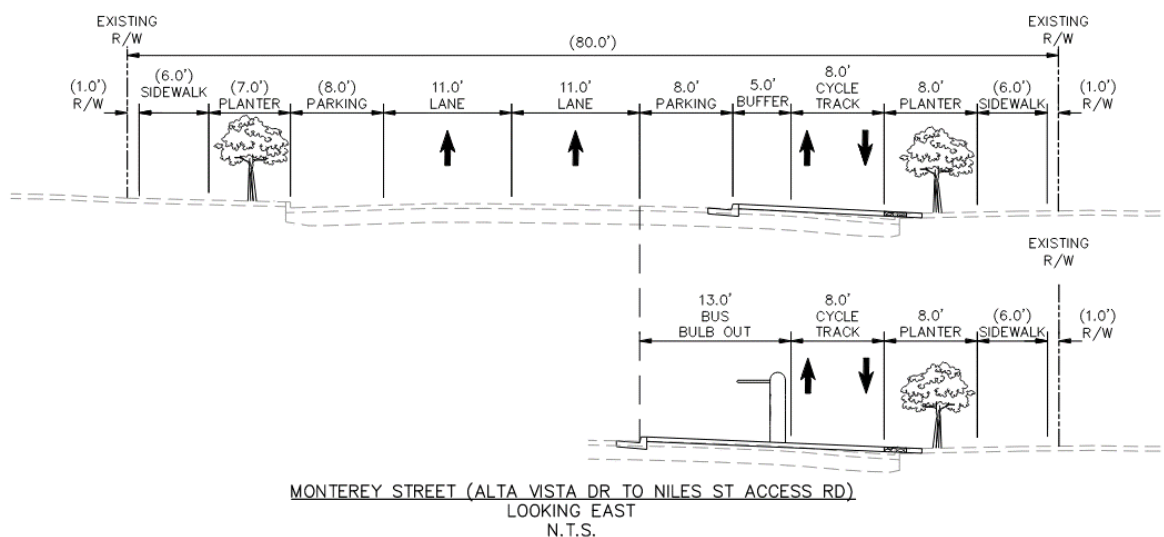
Proposed Cross Section - Monterey Street (Alta Vista Dr to Niles St Access Rd)
